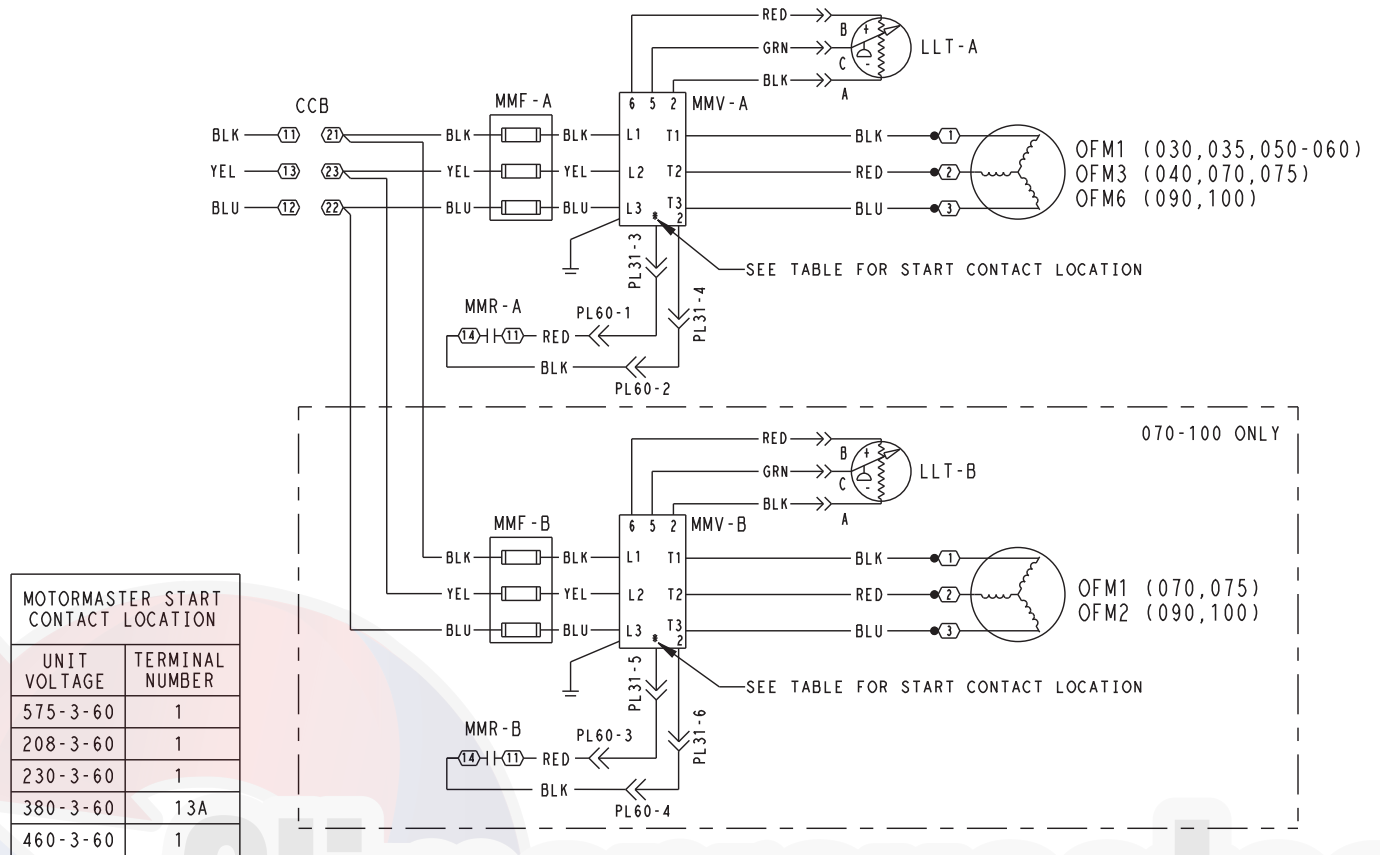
Fig. R — Motormaster® V Wiring (48/50P070-100 Units Shown)
